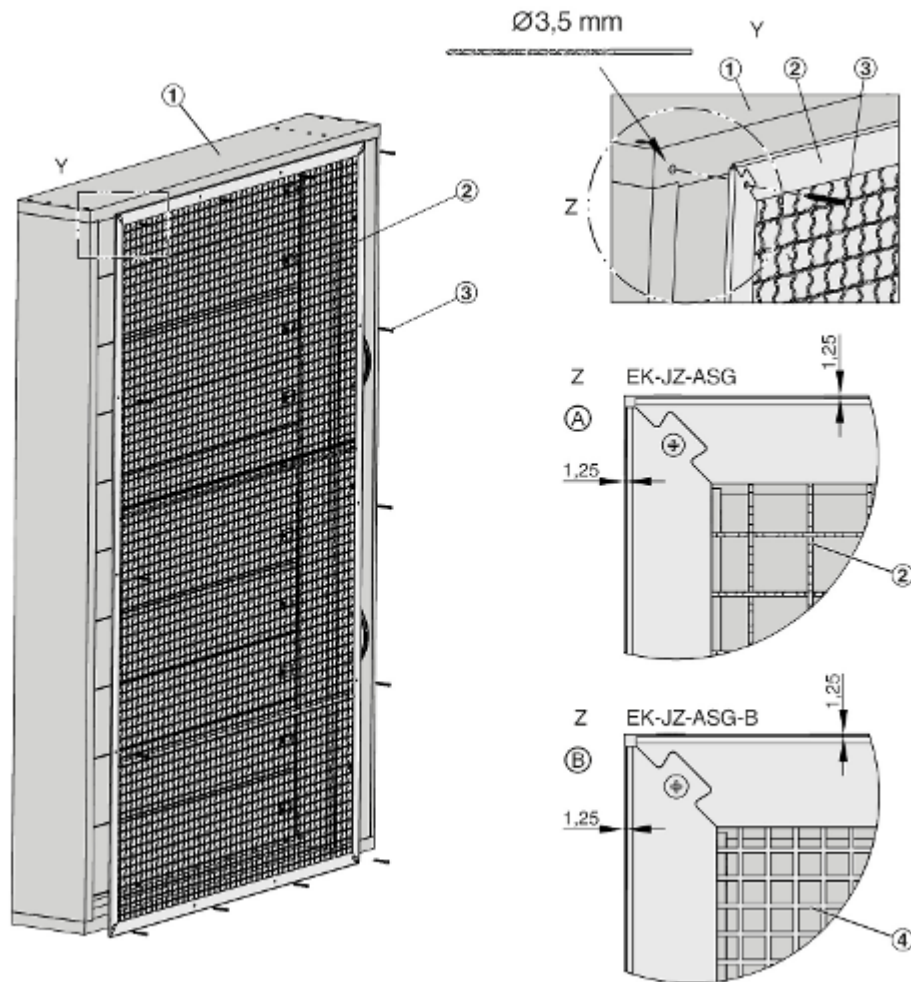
Mounting crimped wire grille or perforated plate grille on EK-JZ
